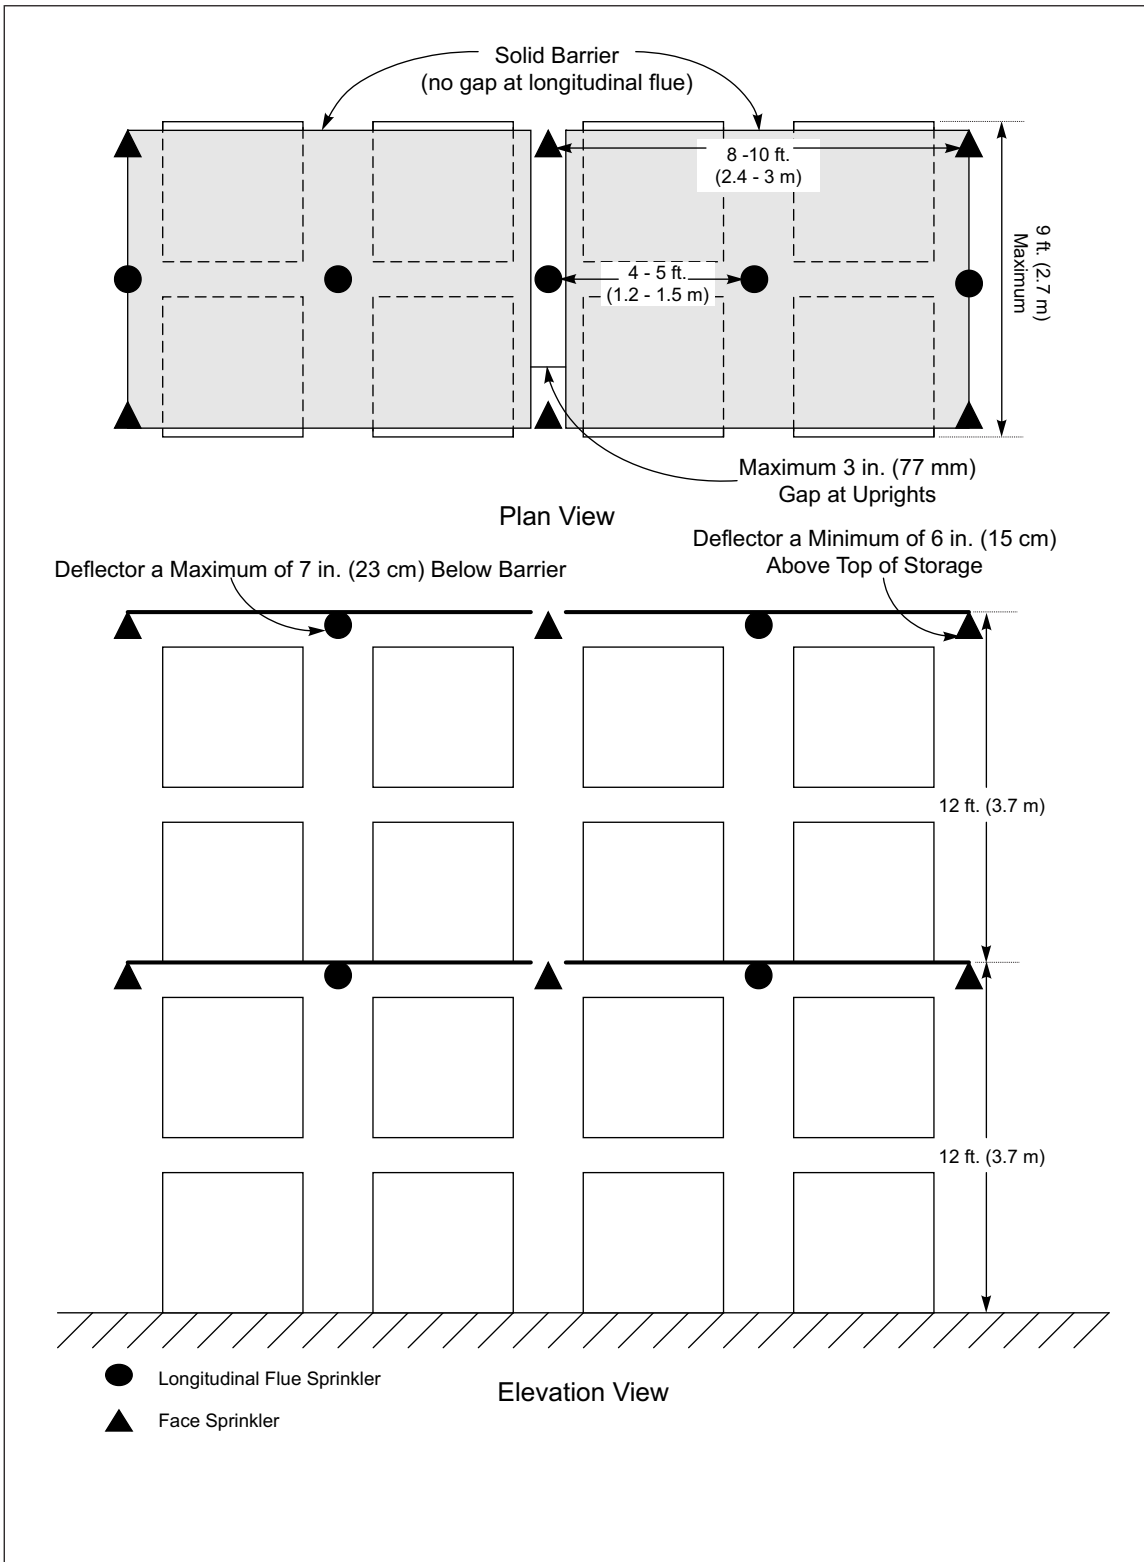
Double row rack in-rack sprinkler layout — Fire Protection Scheme A
